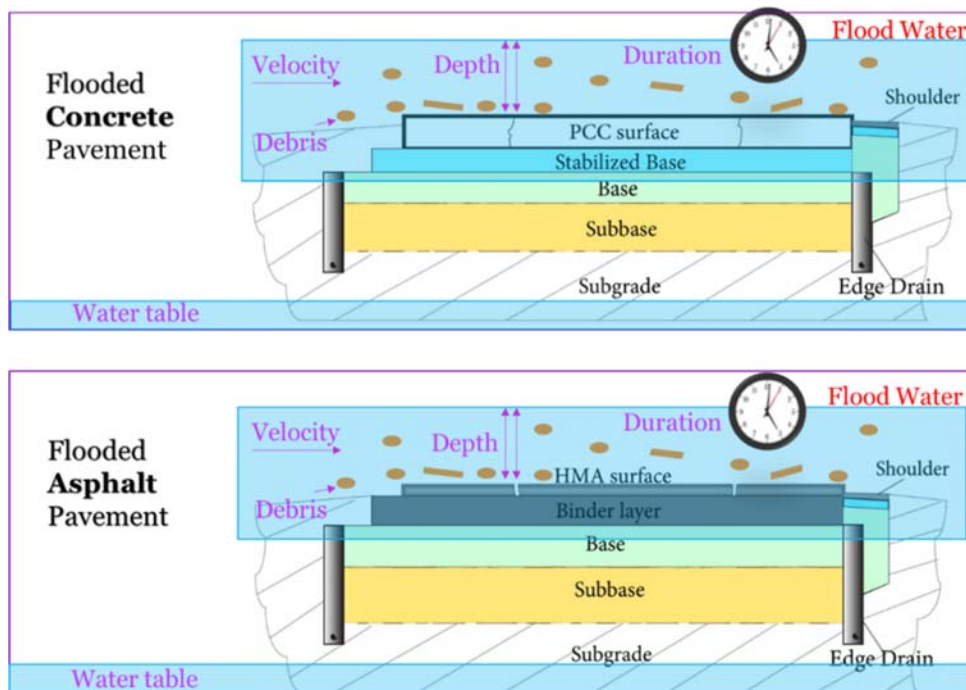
Loads of Flood Water Overtopping on Pavements
